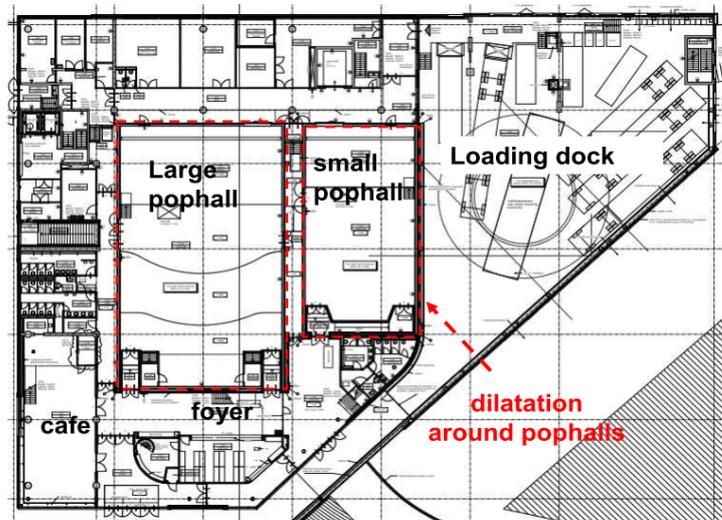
Ground floor plan of popvenue Doornroosje in Nijmegen (NL)
